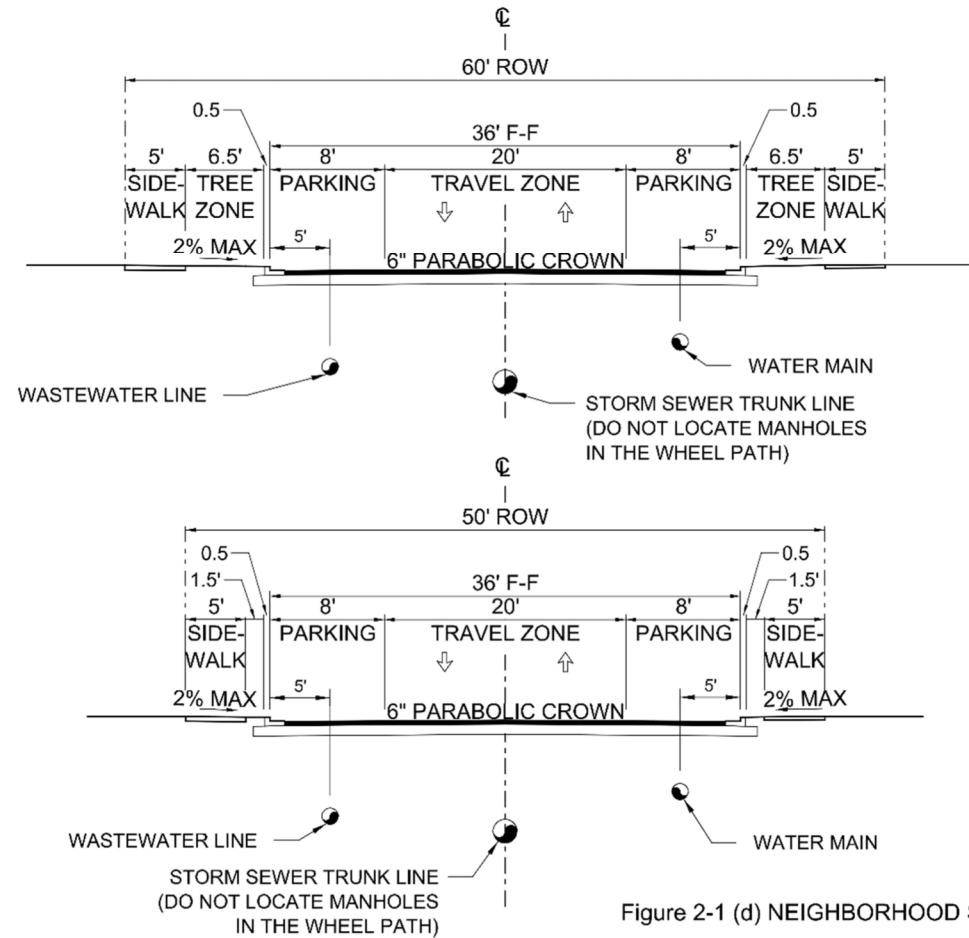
(d) NEIGHBORHOOD STREET TYPICAL SECTION
